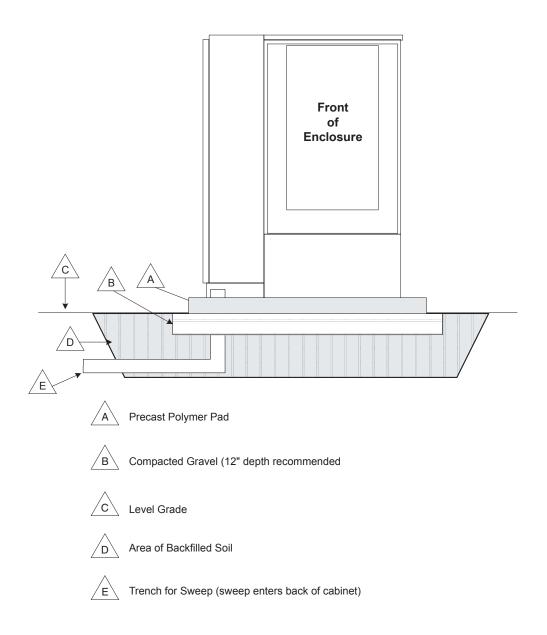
, Typical Site Arrangement, (cabinet with optional side chamber)
